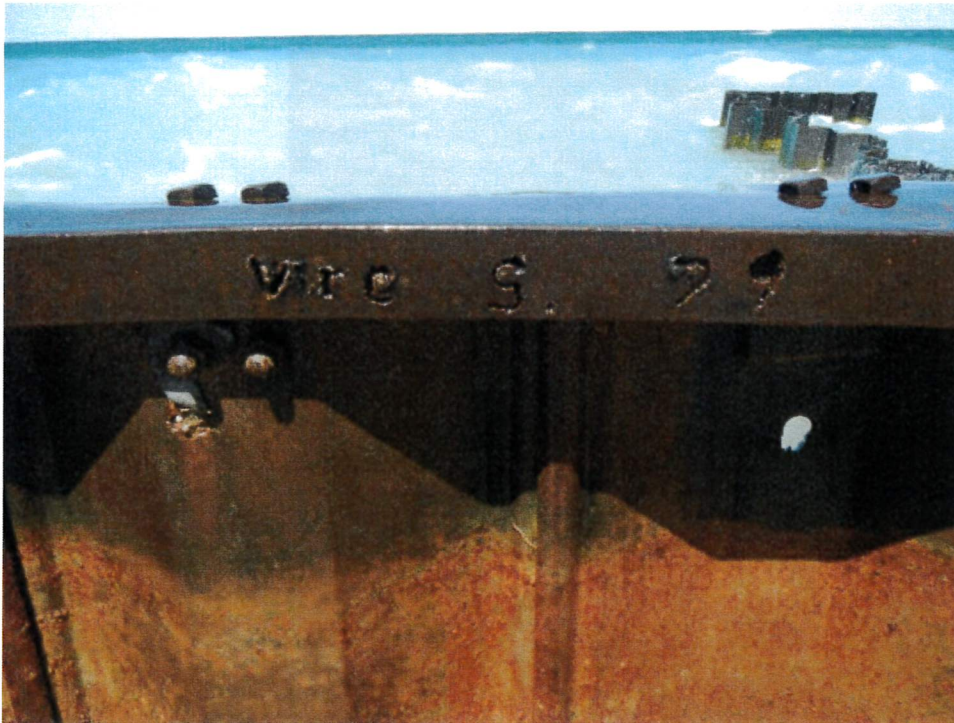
Date burned into steel cap beam. Indicates steel cap beam was installed around 1979. Note steel distortion at bolts.
